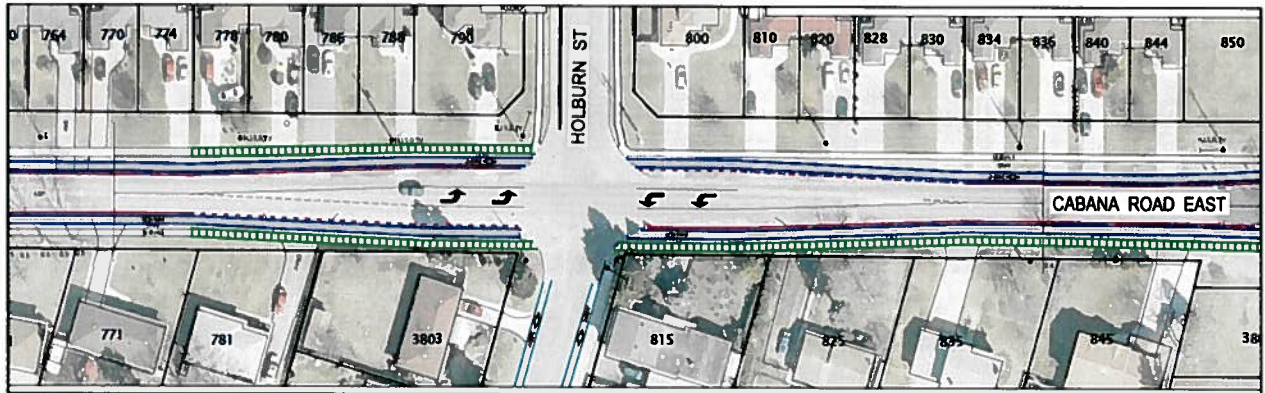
Cabana Road and Holburn St. Intersection Improvements
